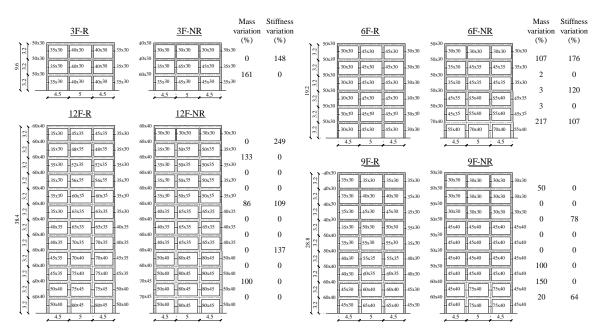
Structures under study (length and height in m, cross sections in cm)
